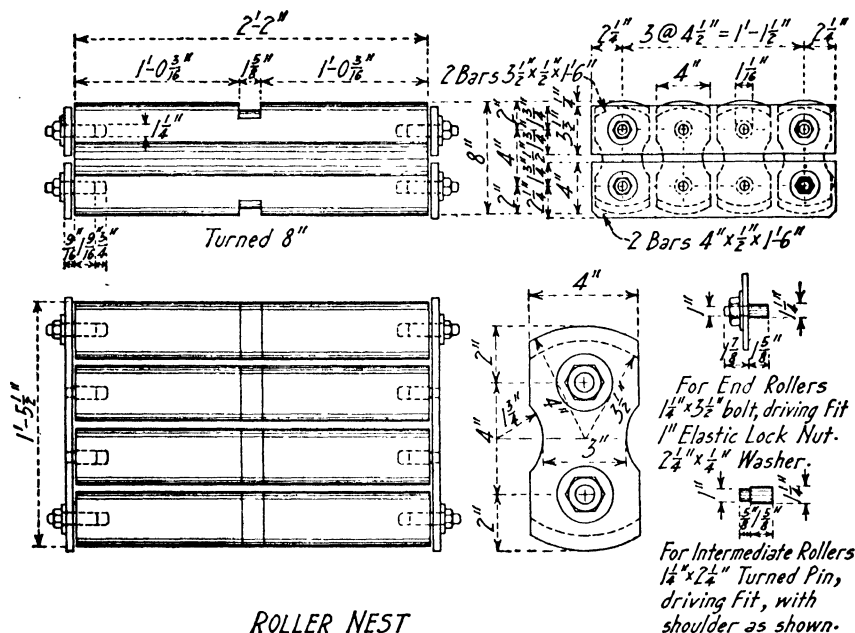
SHOE DETAILS. CHICAGO, MILWAUKEE & ST. PAUL RY.
